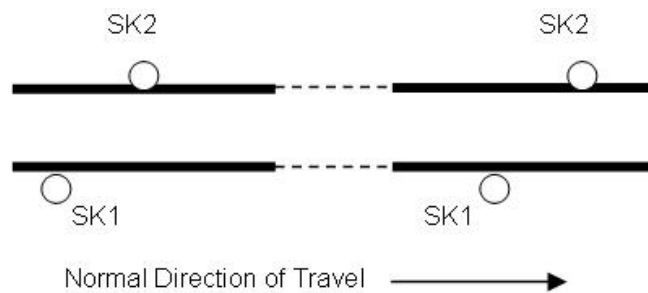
Typical Layout of Single Rail Contact Type (SK11 Heads)
